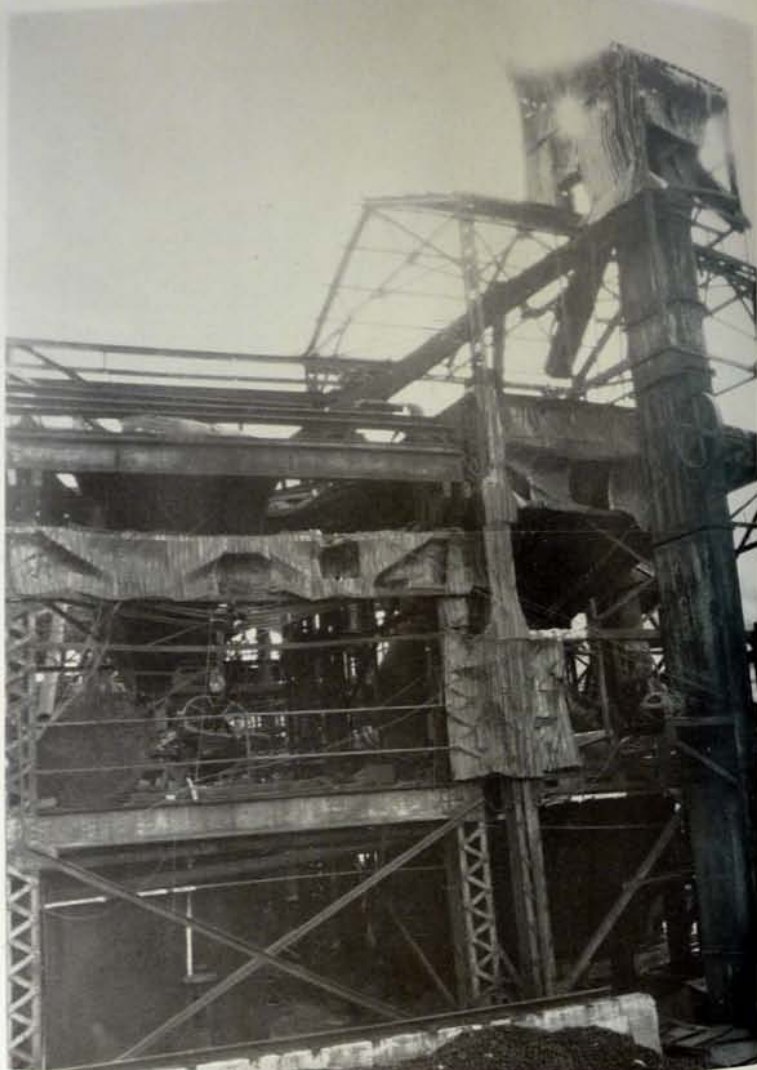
4,300 feet from GZ. Group 31, Building 6. Twenty-eight gage corrugated iron pressed against steel framework by blast.
